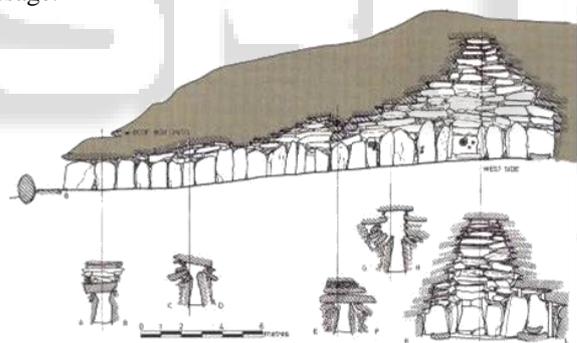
This diagram shows an elevation of the mound at Newgrange, with cross-sections of the entrance tunnel at various points along it's length.
